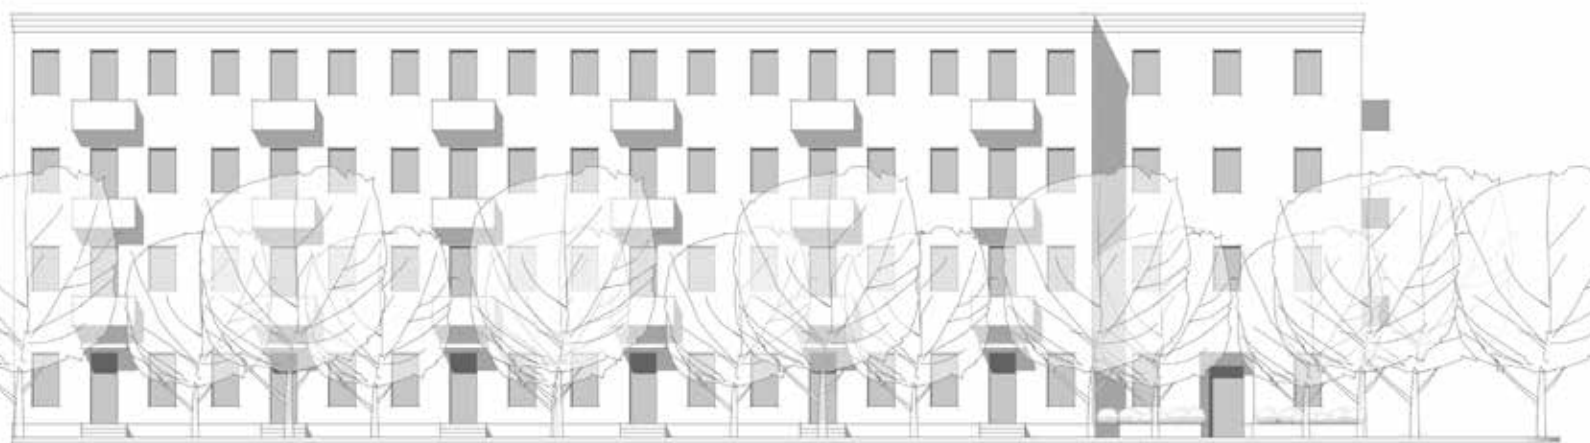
Examples of how a corner garden, stoops, balconies, a recessed common entry, and landscaping can reduce the scale of large buildings while providing resident amenities.
